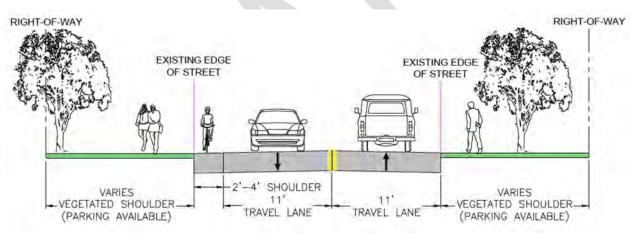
Coleman Avenue Existing Cross Section (Menlo Oaks) Looking East Toward Willow Road
